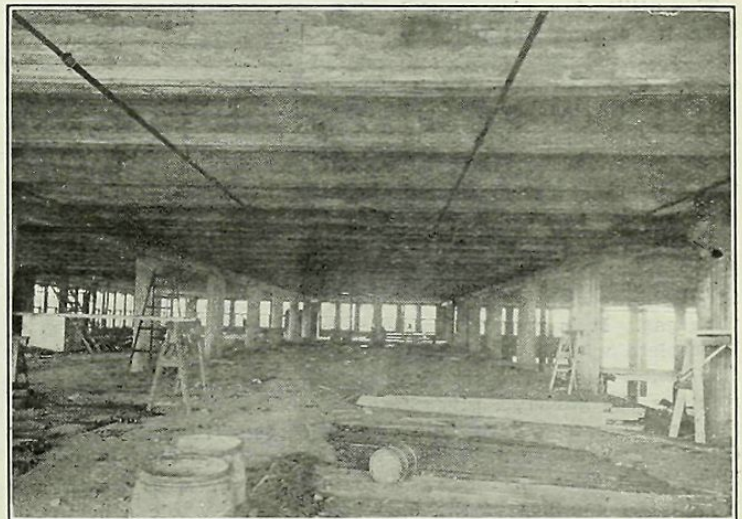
FINISHED FLOOR PANEL OF 35-FOOT SPAN.
